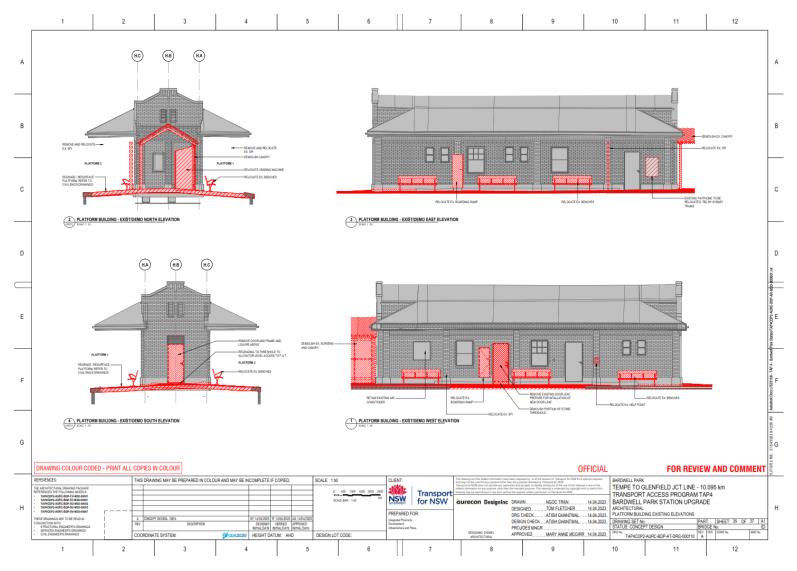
Elevations of demolition plan for Platform Building at Bardwell Park Station (Source: Aurecon, 2024)
